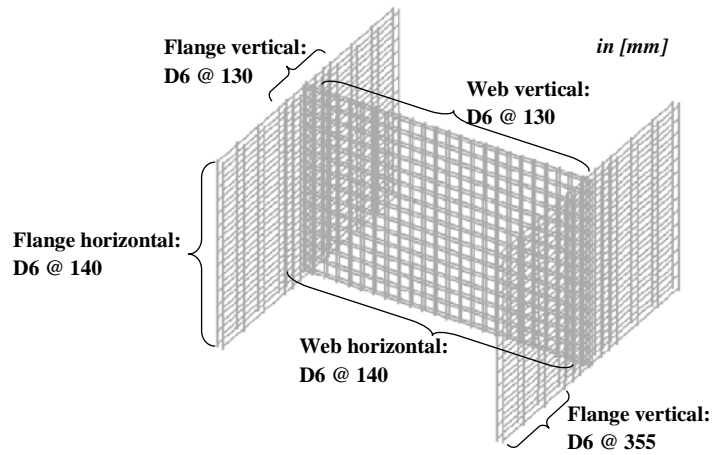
Reinforcement layout for H-shaped wall system (DP1).
